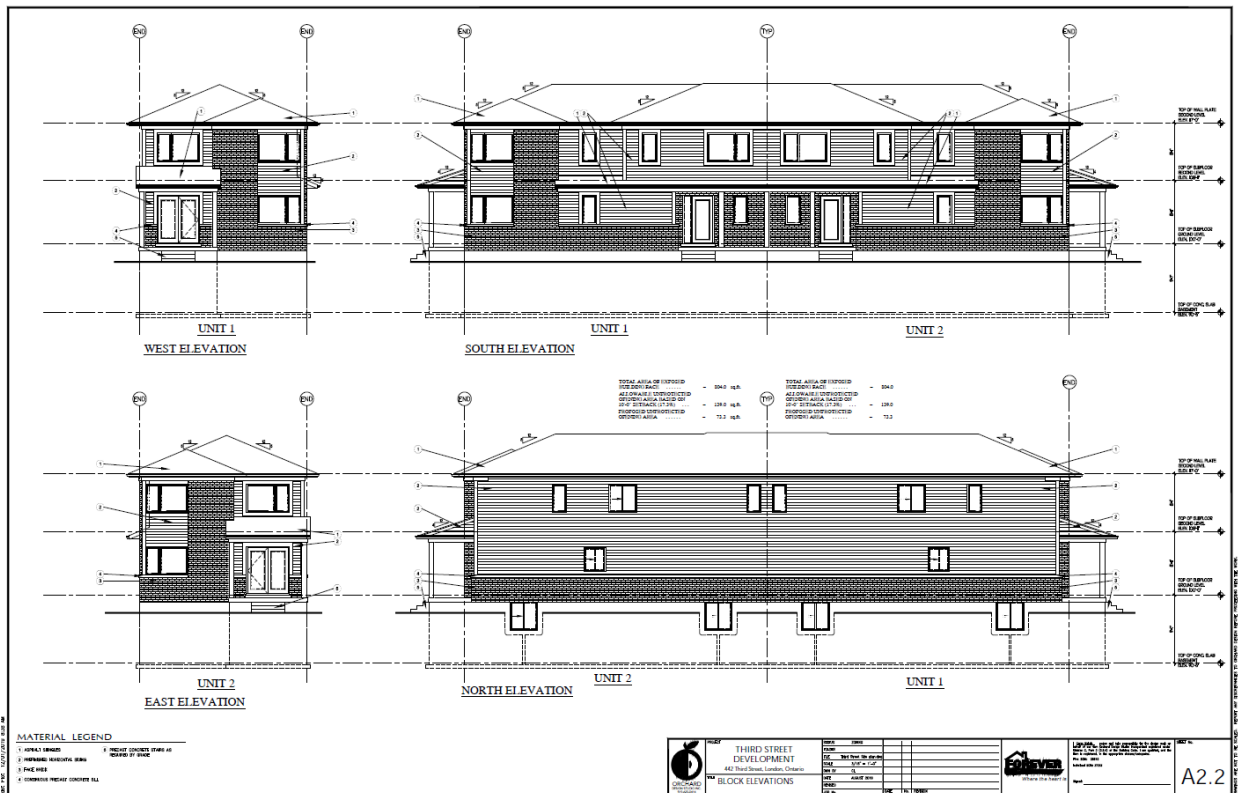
Proposed 12 unit building Elevation – submitted by applicant
